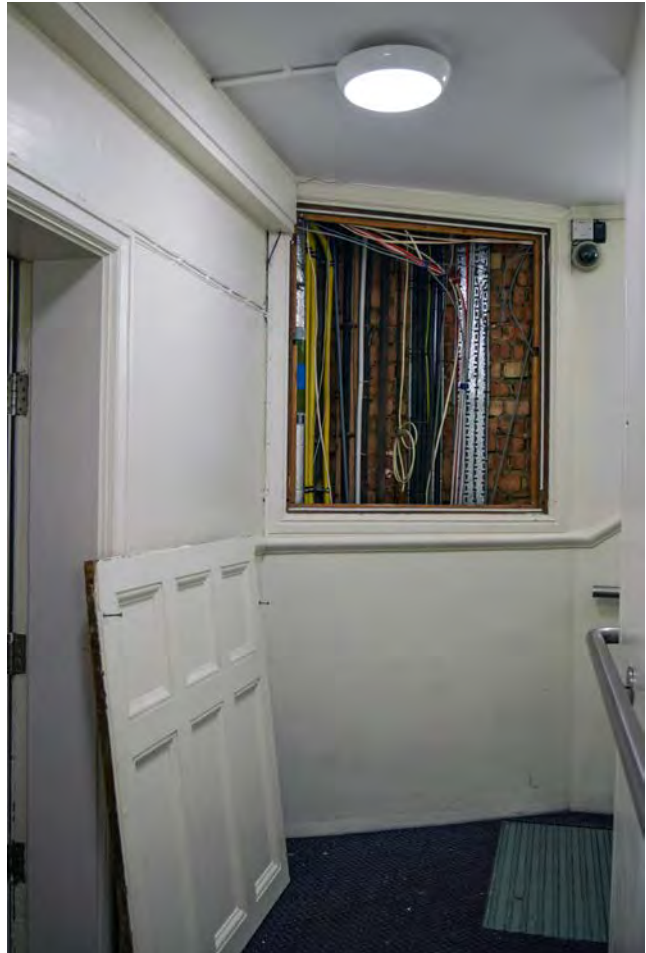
The half landing between the ground and first floor of Oxford Language School, looking west
